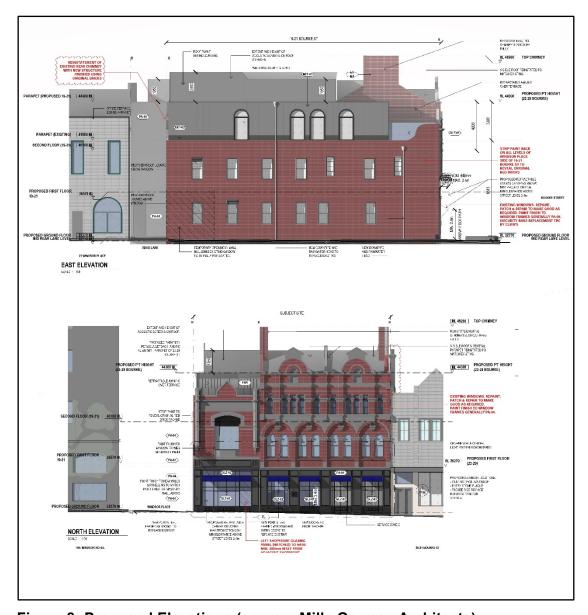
Proposed Elevations (source: Mills Gorman Architects)
